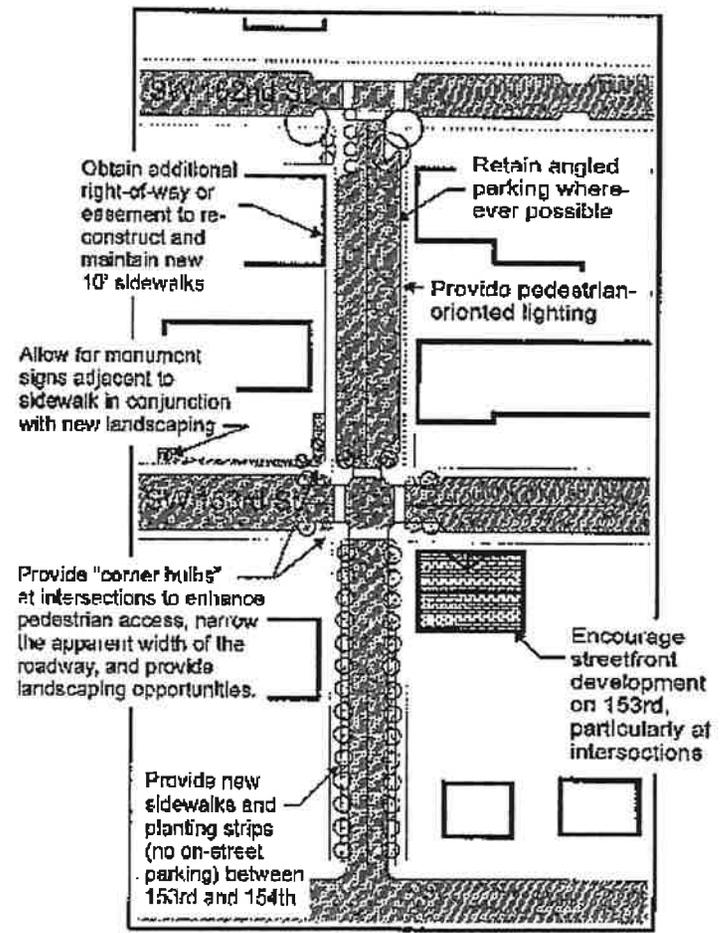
Typical cross street layout and plan for Second, Fourth, and Sixth Avenues Southwest between Southwest 152nd and 154th Streets.
